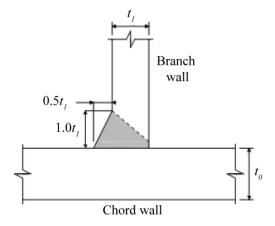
Weld dimensions (adapted from [27,28,30])
